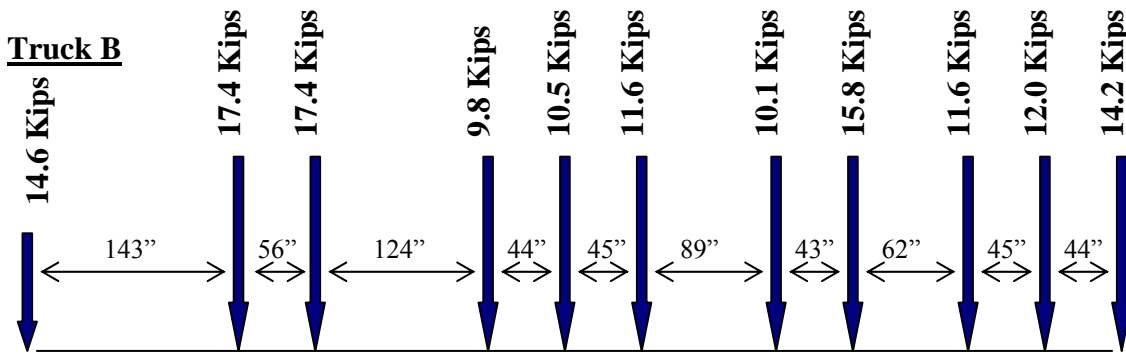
Truck B configuration, Bridge (S08-77024)
